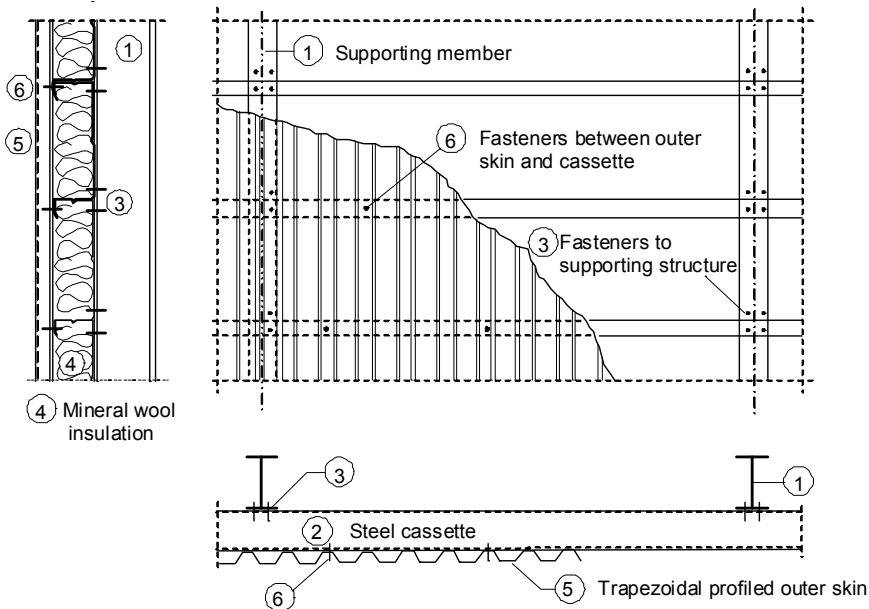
Two layer built-up wall cladding system for industrial buildings
